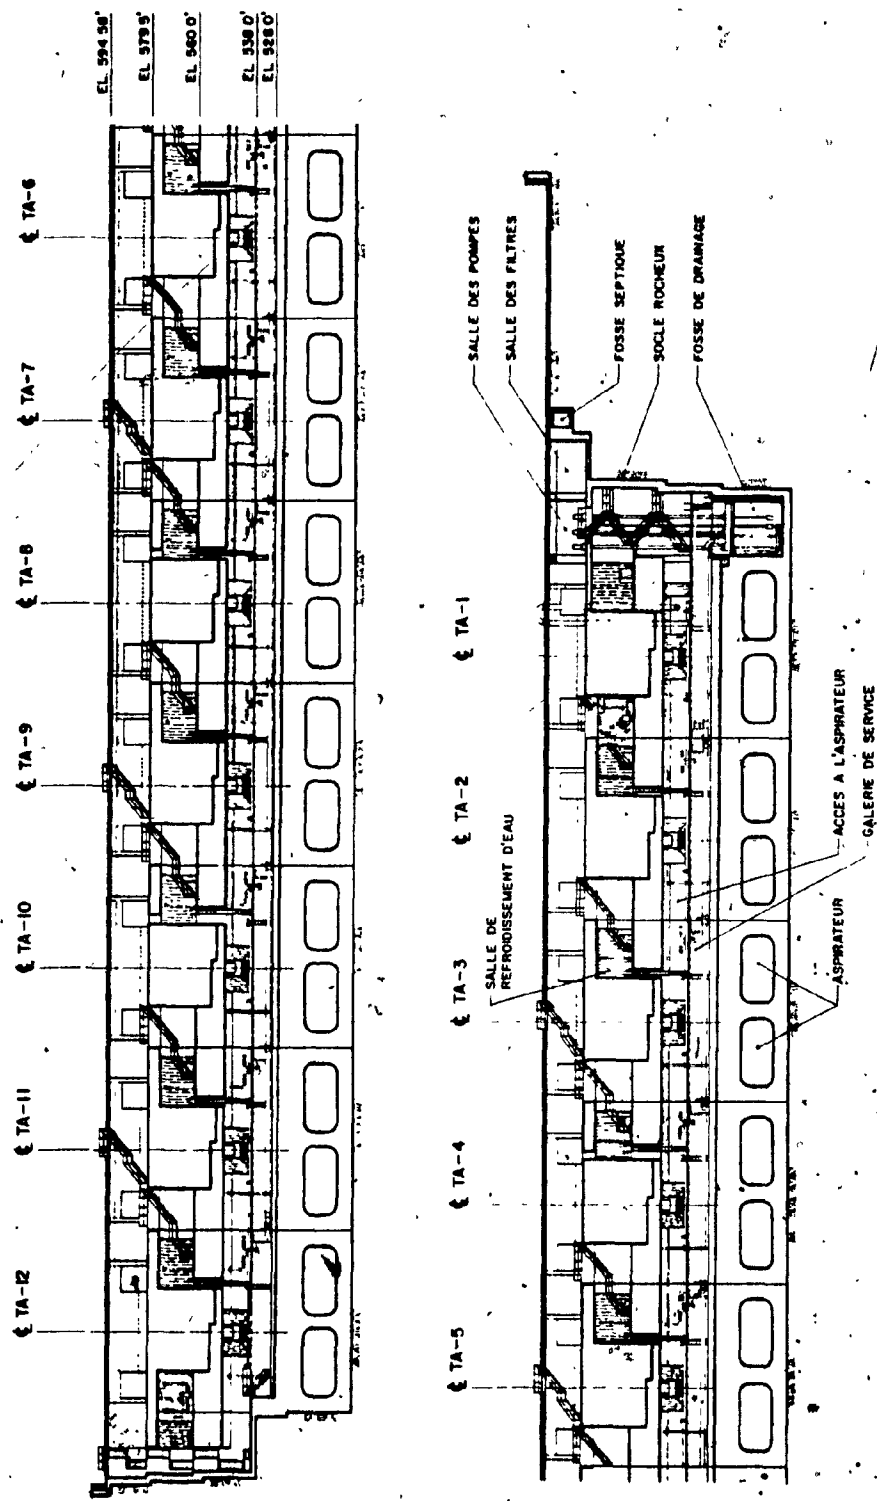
LG-3 Powerhouse Longitudinal Section.
